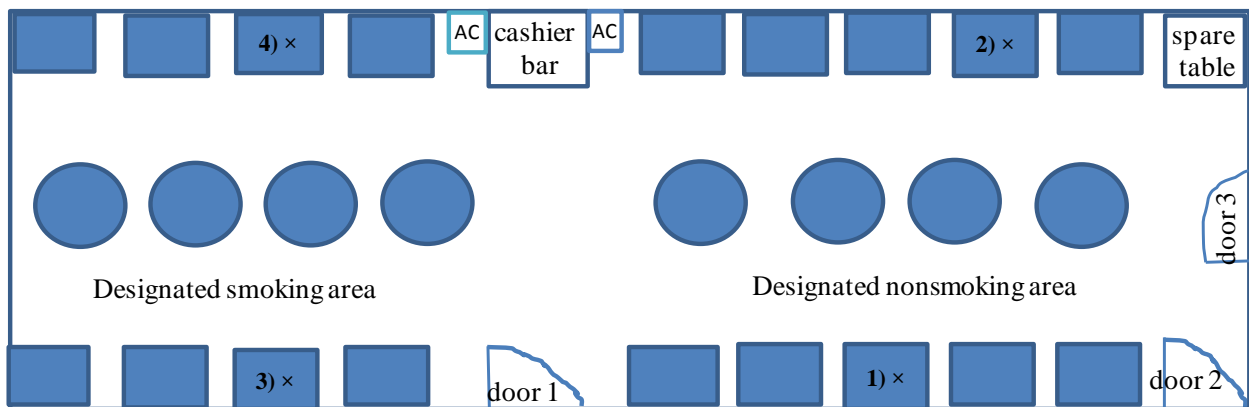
Floor plan of Restaurant 2 with designated smoking area and nonsmoking area
